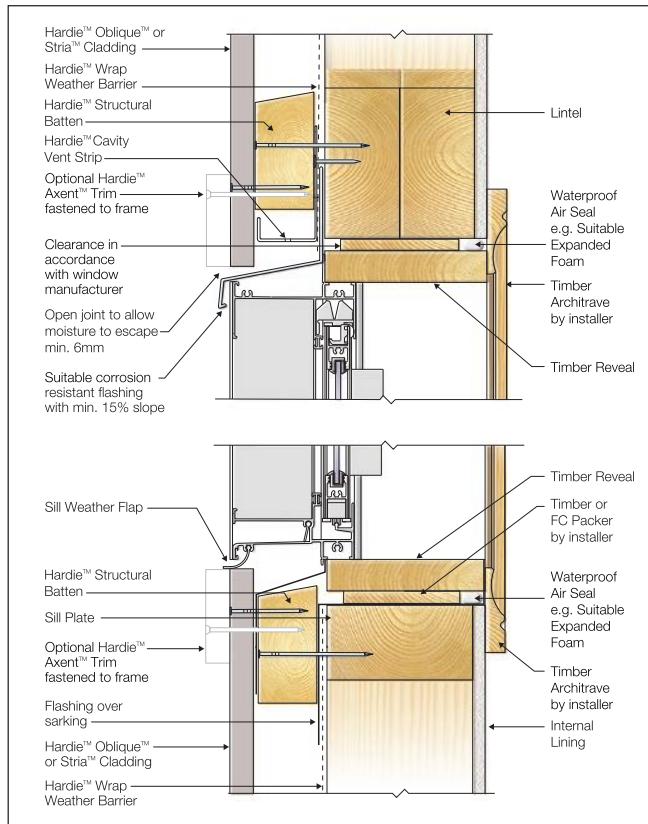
WINDOW HEAD AND SILL - TRIM
